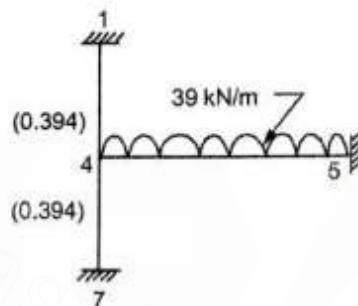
Loading Case for Maximum Column Moment at joint 4
